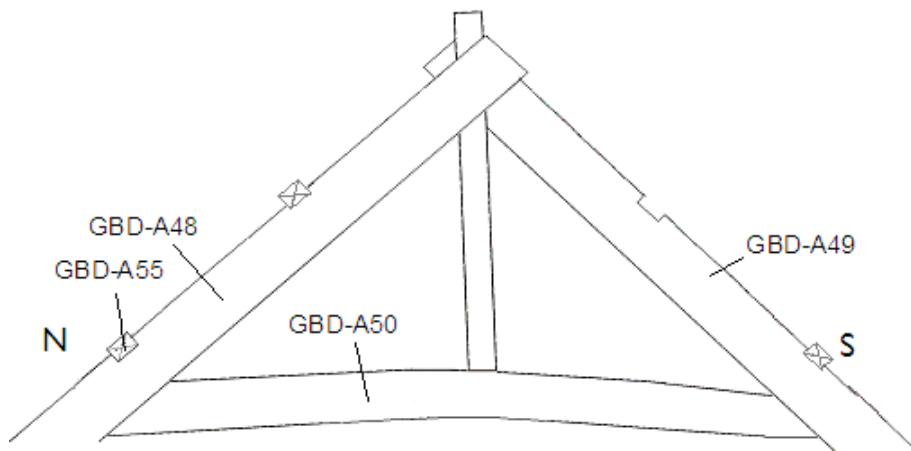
Central range; truss 5 (based on sketch of truss 4), showing the location of samples GBD-A48–50
